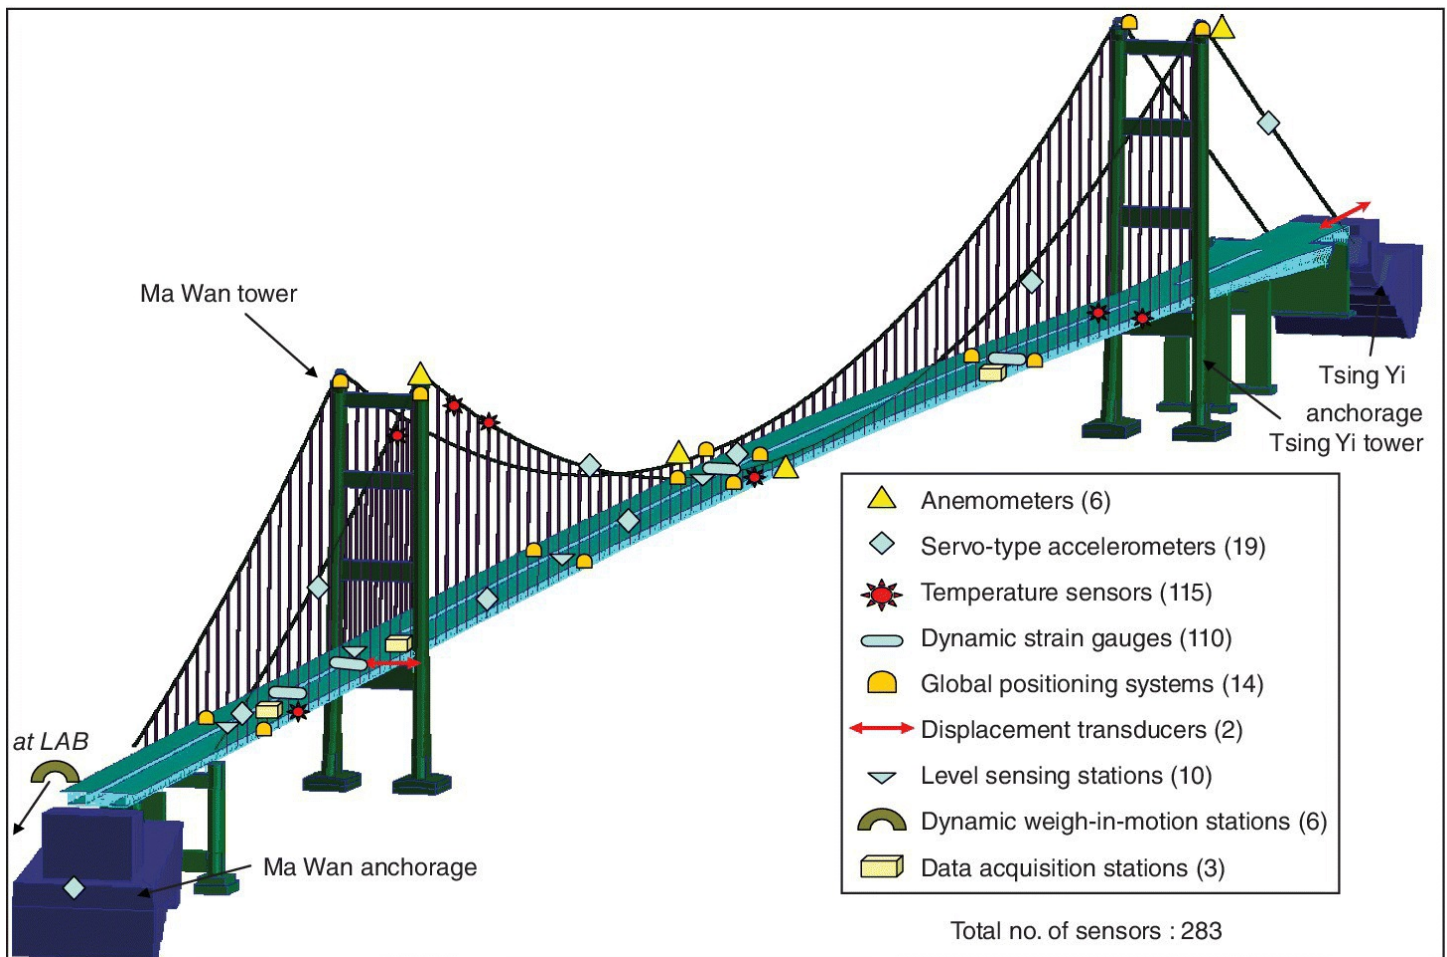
Instrumentation layout of sensory systems for structural monitoring in Tsing Ma Bridge.
